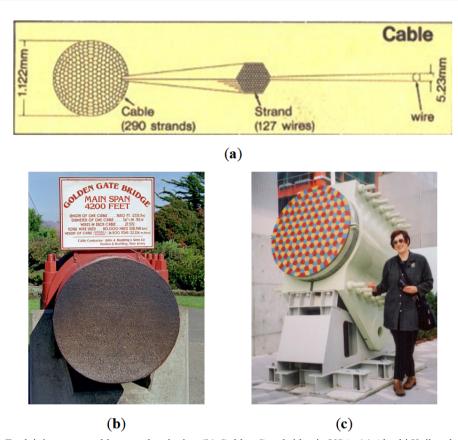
(a) Explaining terms cable, strand and wire; (b) Golden Gate bridge in USA; (c) Akashi Kaikyo bridge in Japan.
